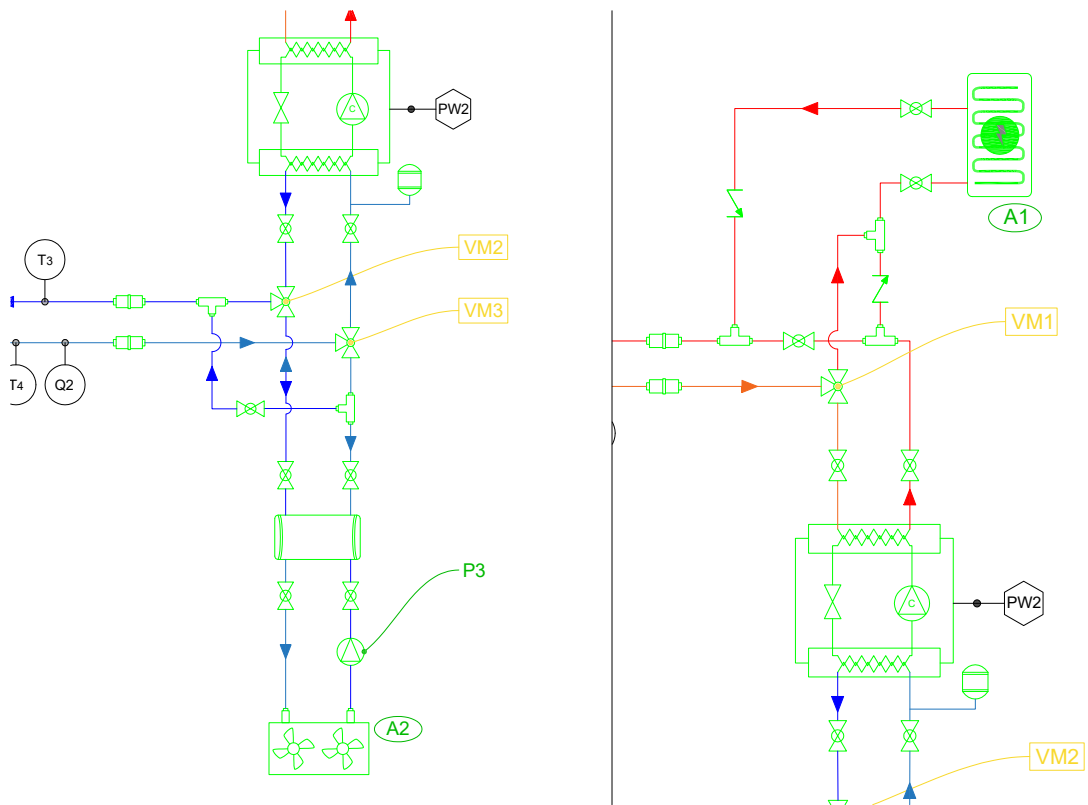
CAD scheme: Auxiliary Cooler connection(left) and Heater (right)
